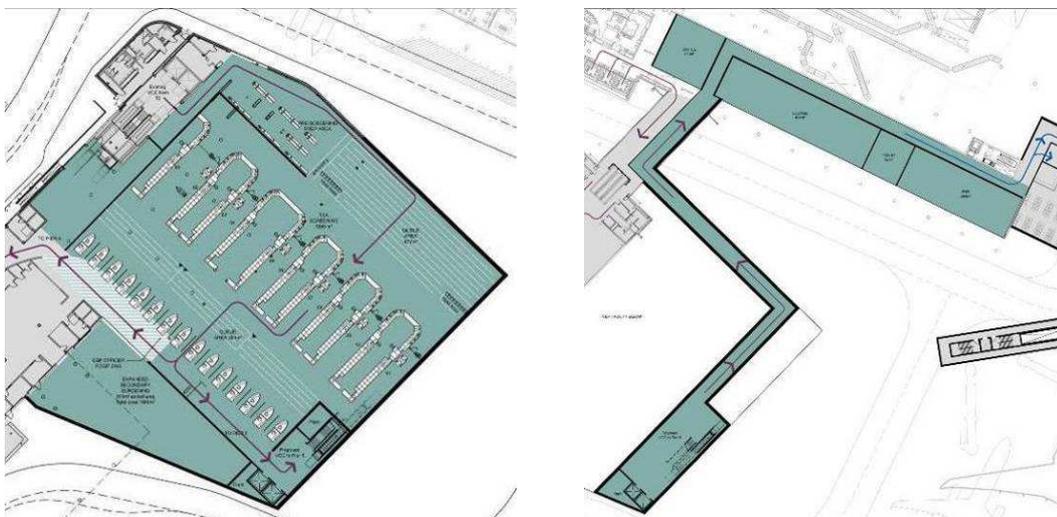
Pier 4 proposed enlarged CBP facility at Apron level and First floor access to Pier 5
